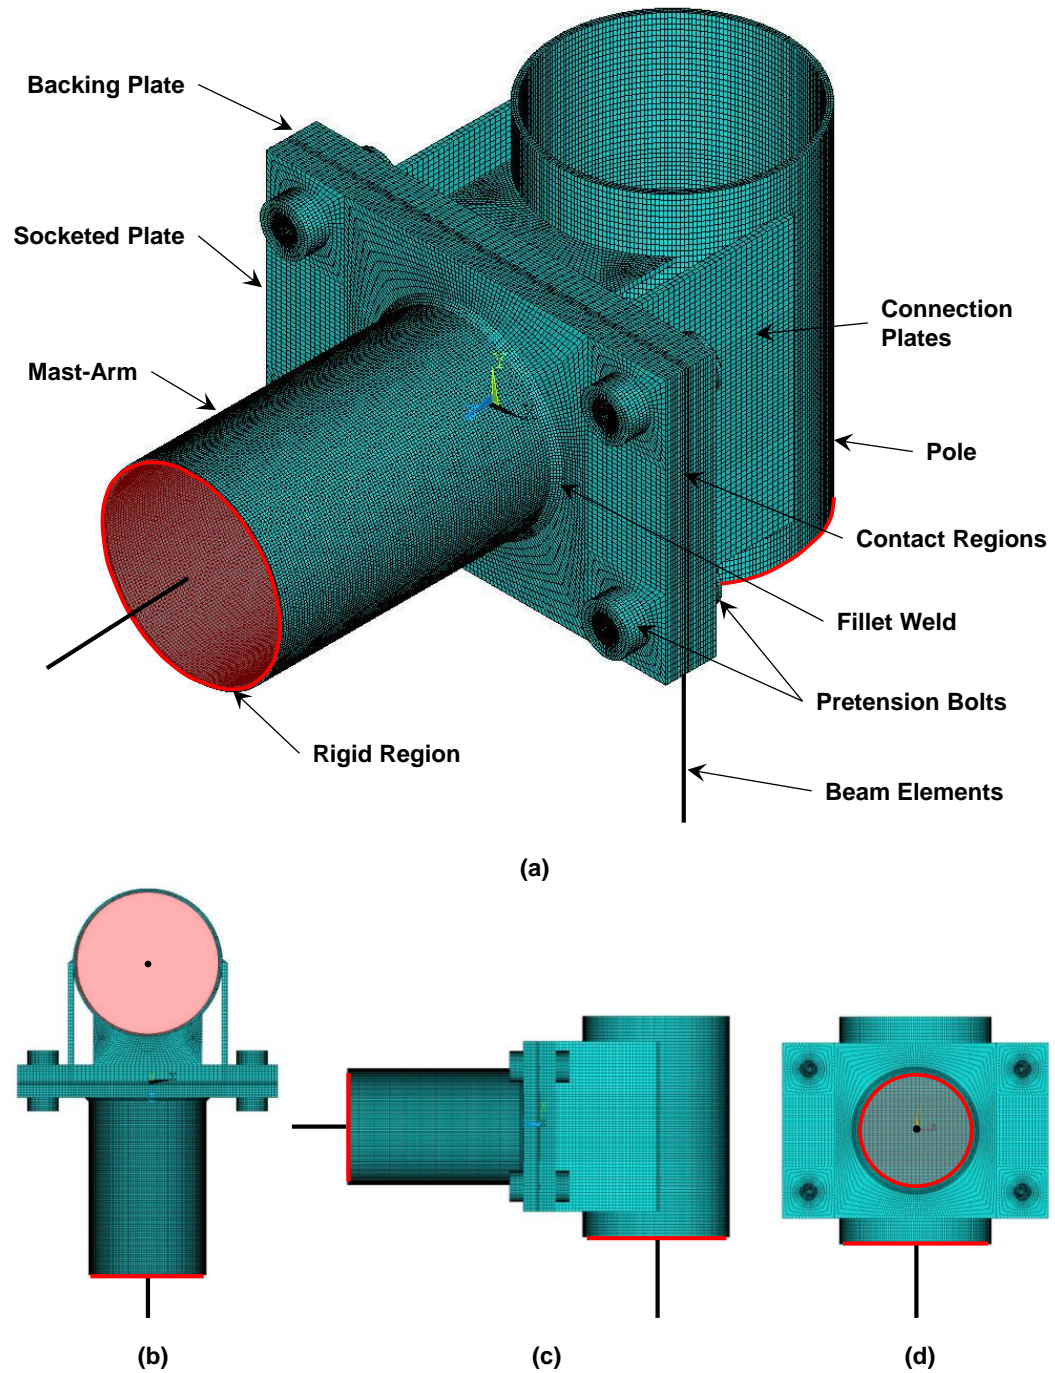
Osseo structures – detailed views of high-fidelity connection geometry and mesh: (a) labeled isometric view, (b) top view, (c) side view and (d) front view.
